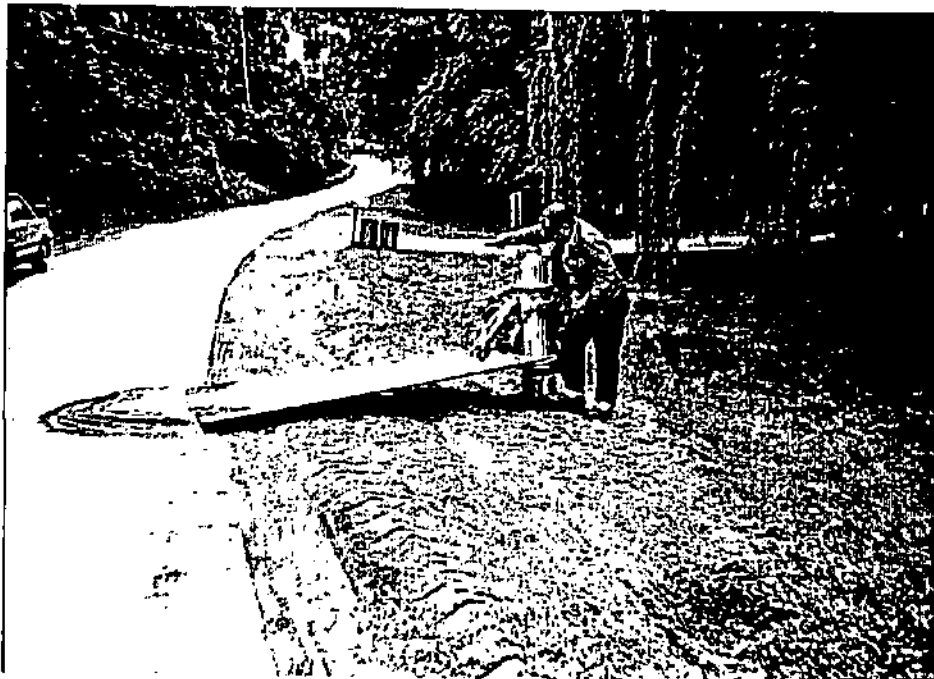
North Bloomfield, N.Y. 9/23/87. A hydrant valve is being opened to flush the water main.
